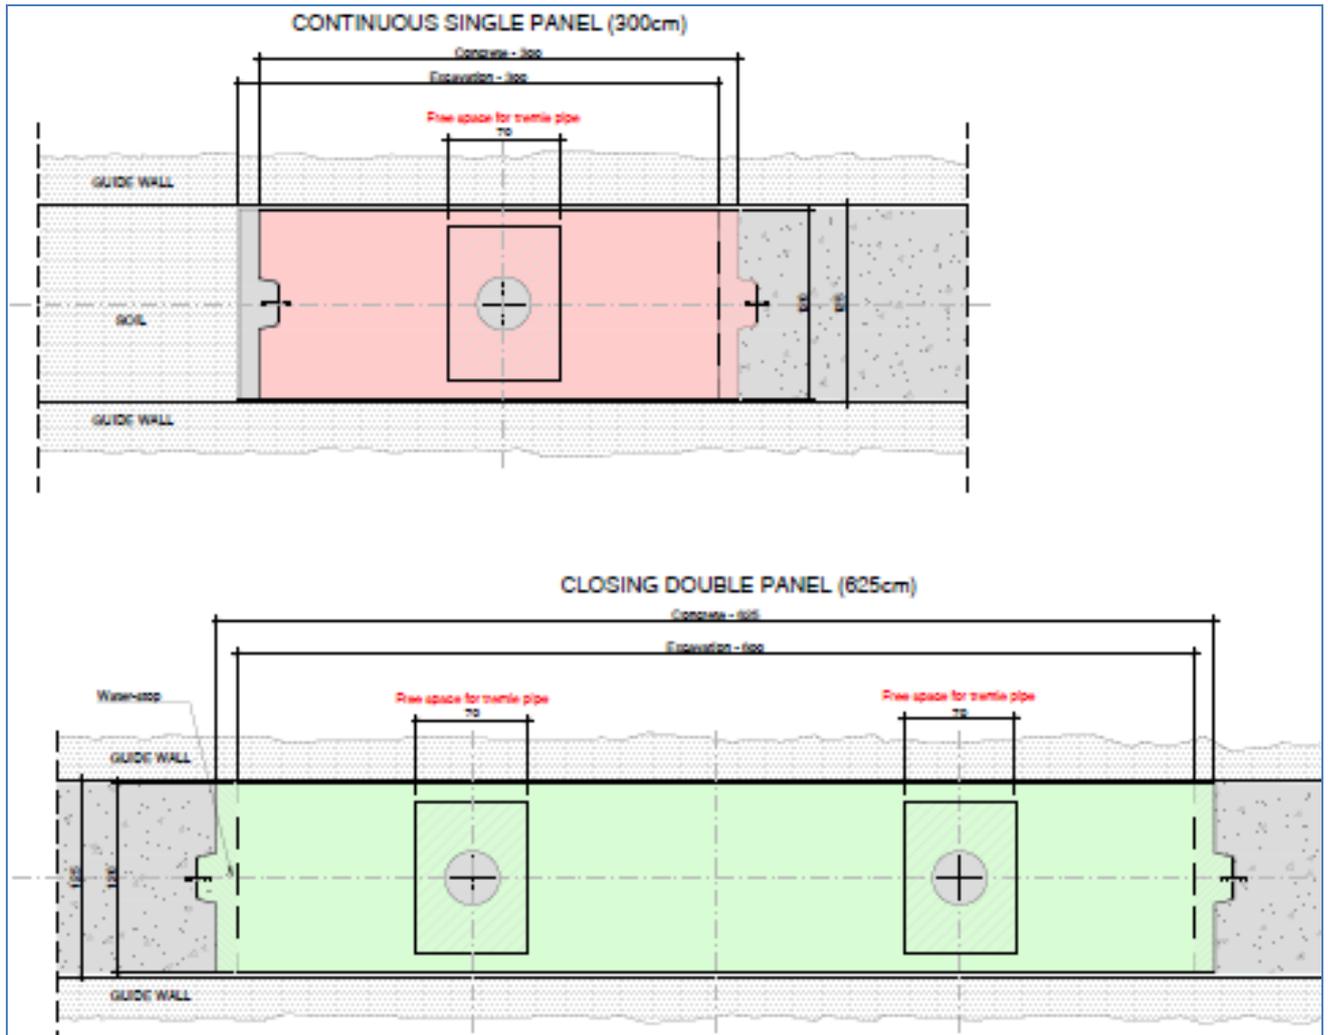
Typical panel sections in diaphragm wall with watertight joints between panels.
